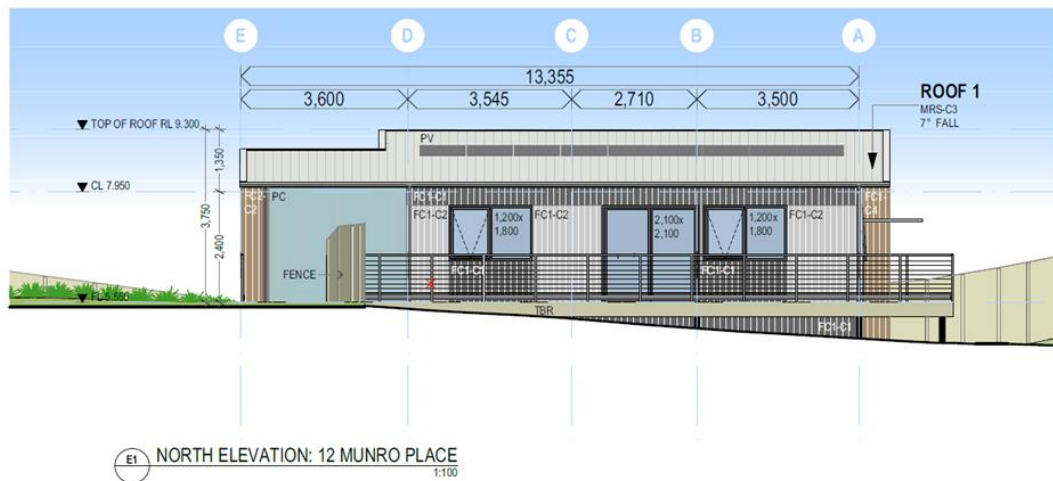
The northern elevation of the dwelling facing the property at 10 Munro Place.
